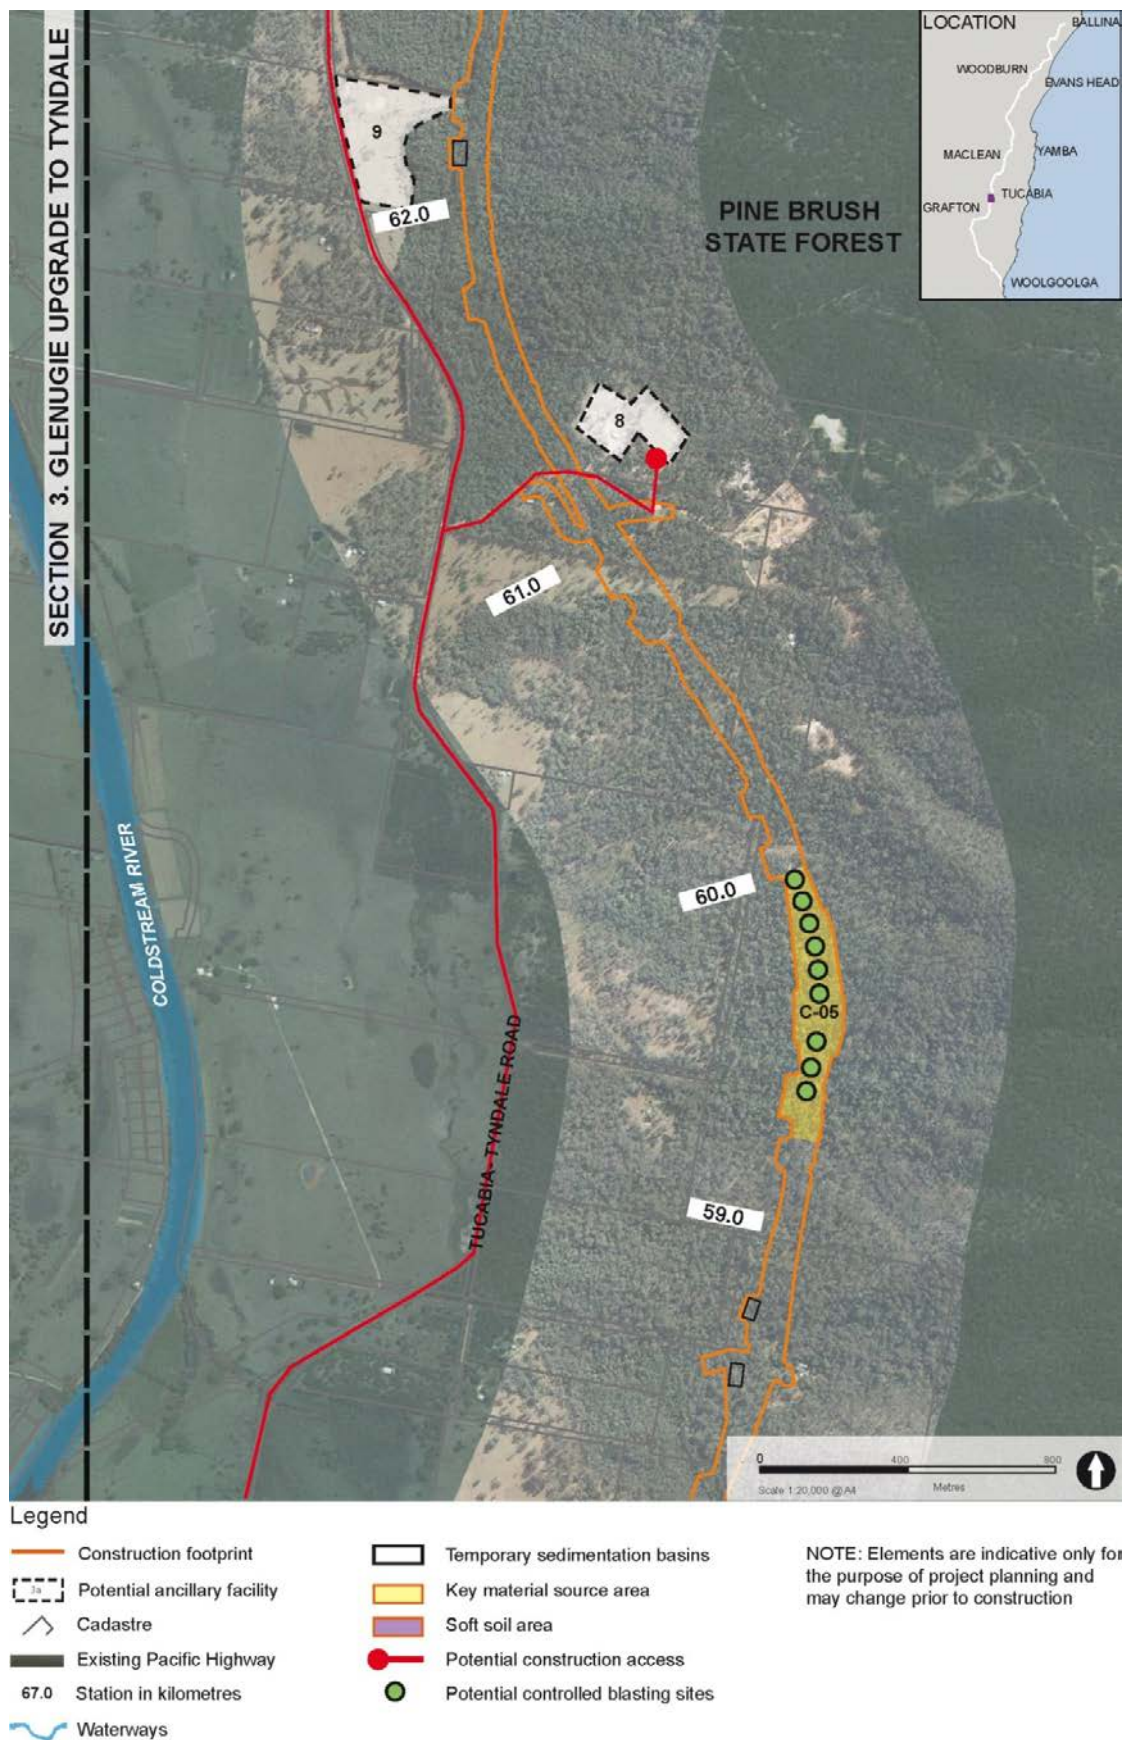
Extent of construction and construction features Section 3 (Station 58.3 to 62.5)
